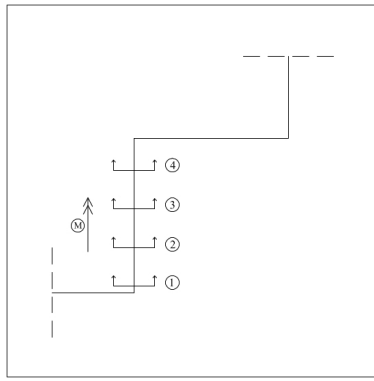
The analysed vertical sections of the wall retaining the concave corner
